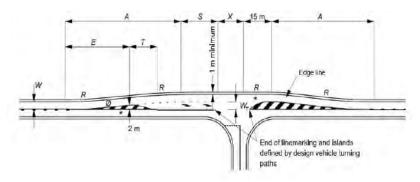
Typical CHS Intersection: AustRoads Guide to Road Design - Part 4A
